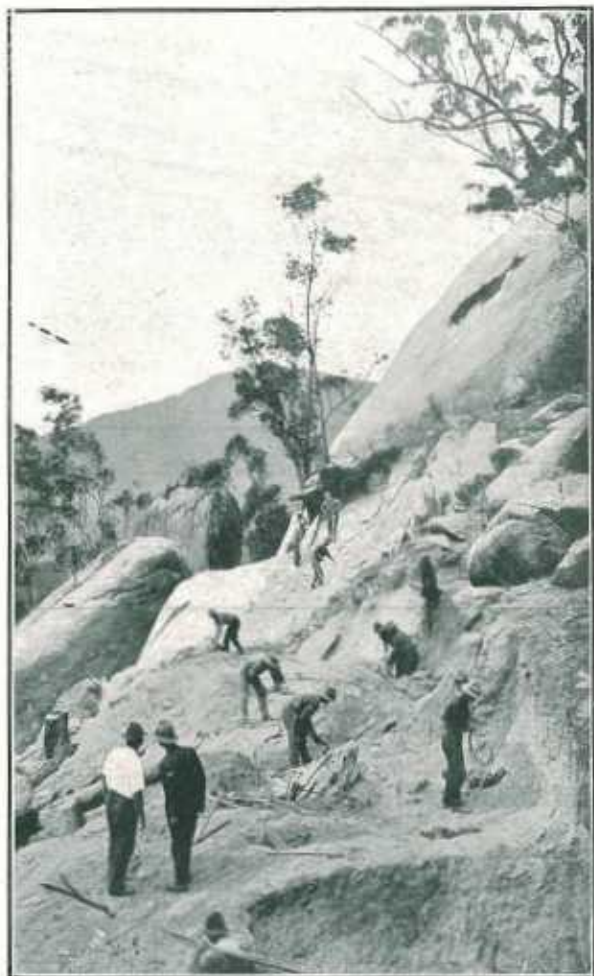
CAIRNS-TABLELAND ROAD. MEN WORKING MACHINE ROCK DRILLS.
